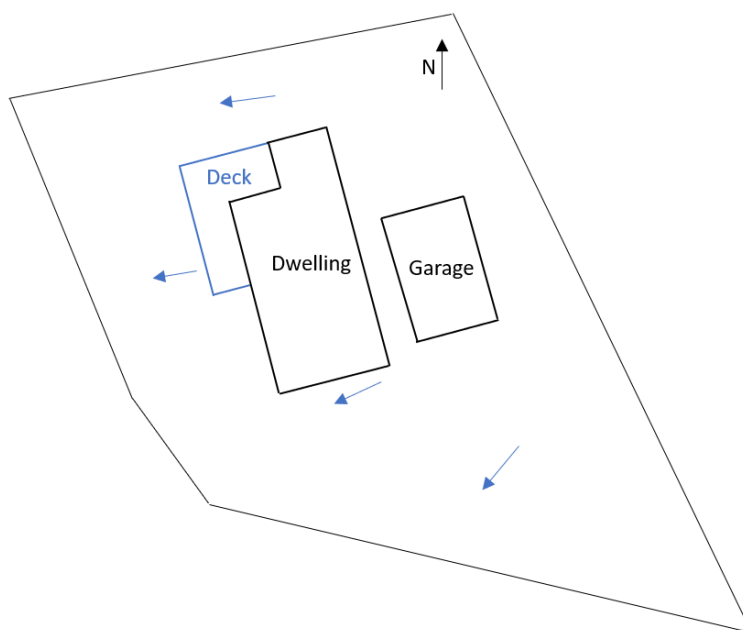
Site plan (blue arrows indicative of the land direction sloping downhill) (not to scale)
